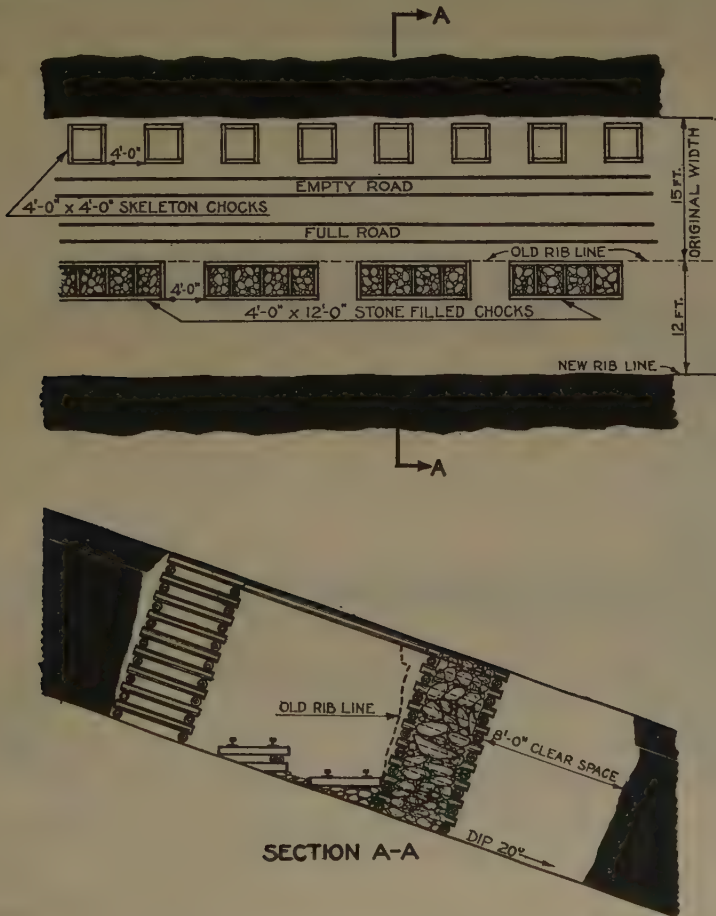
PLAN SHOWING WIDENED LEVELS.
